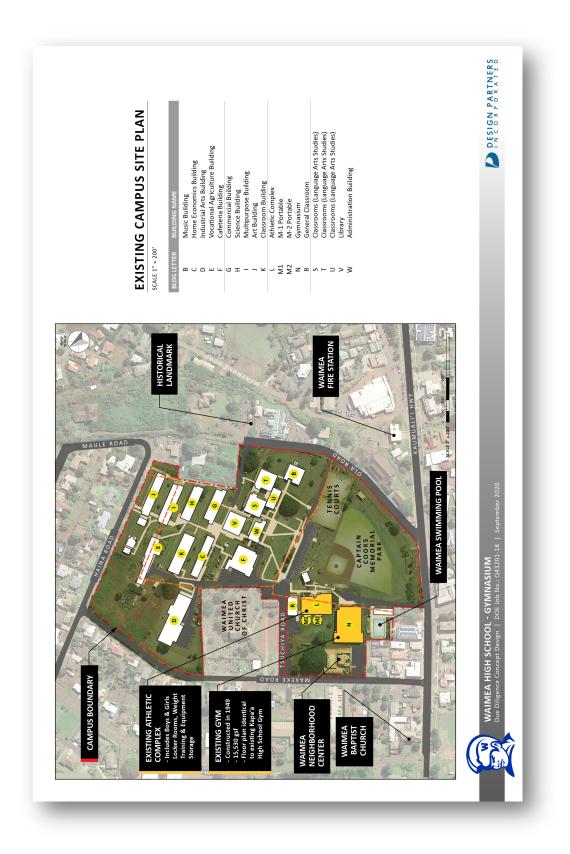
Existing Campus Site Plan Source: Design Partners Incorporated
